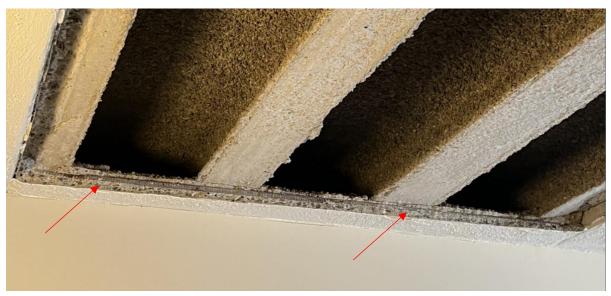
Edge of soffit at failure line (note reinforcing steel)
